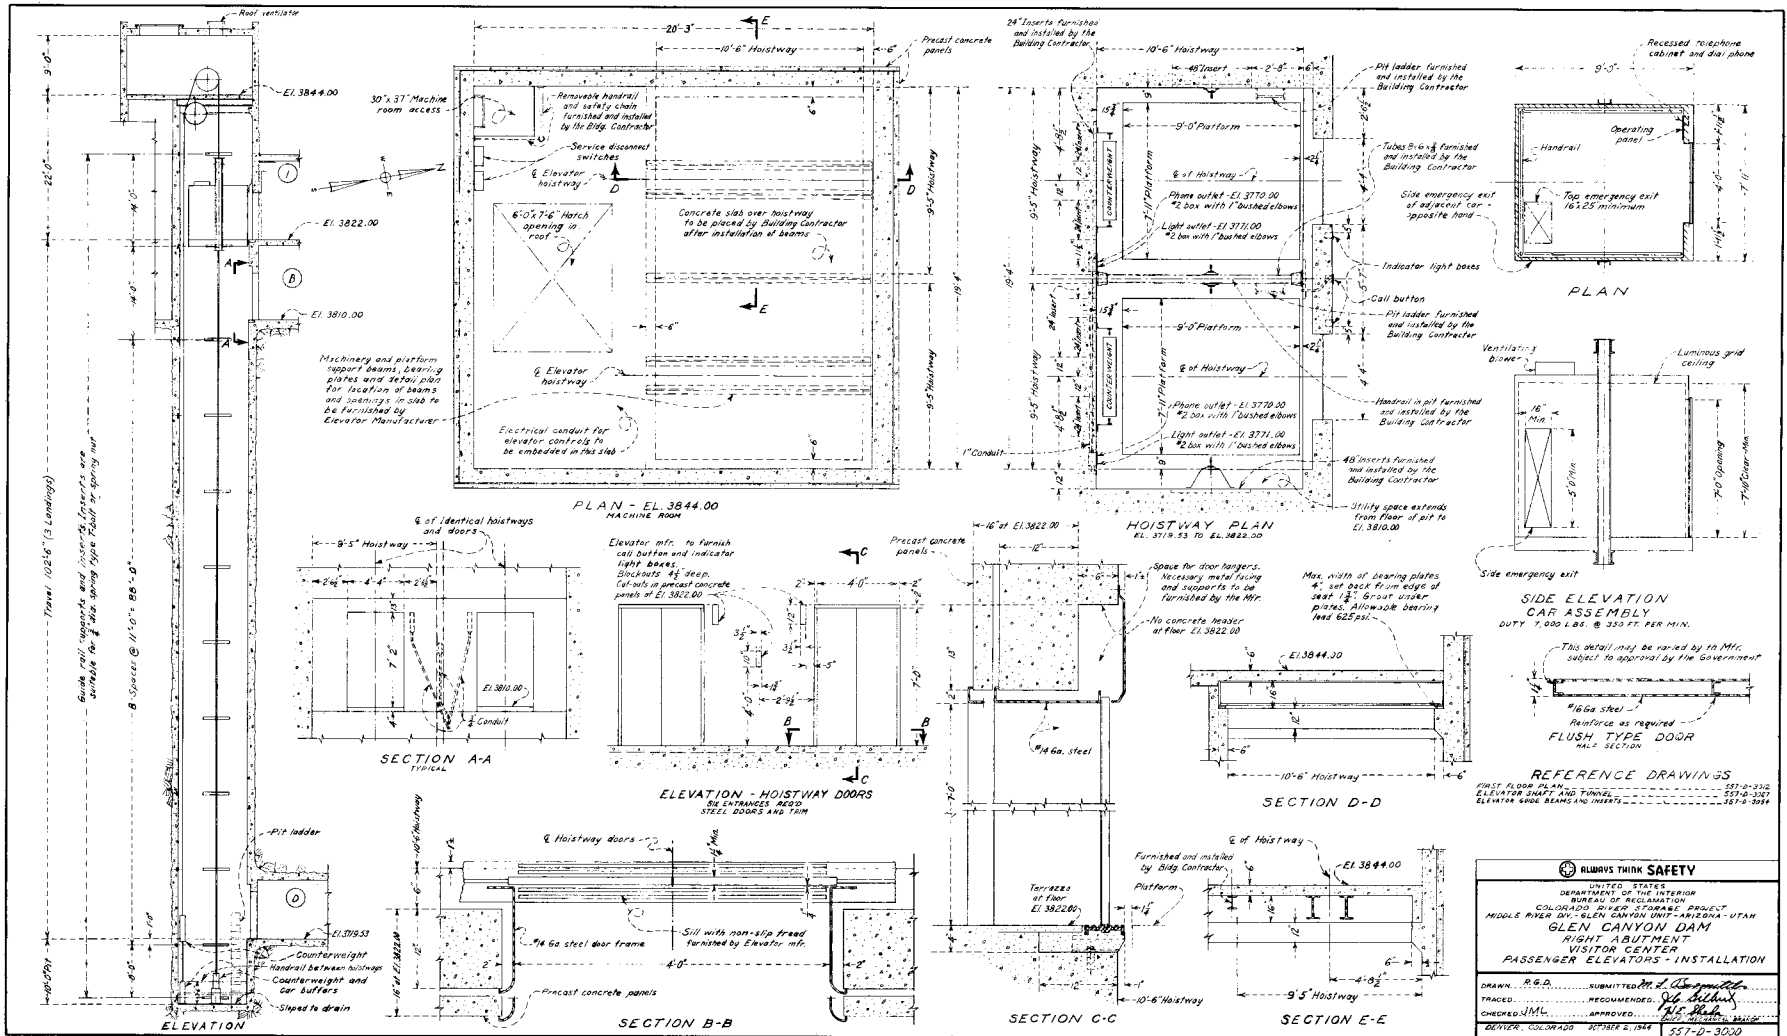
Visitor center and right abutment passenger elevators—Installation.
